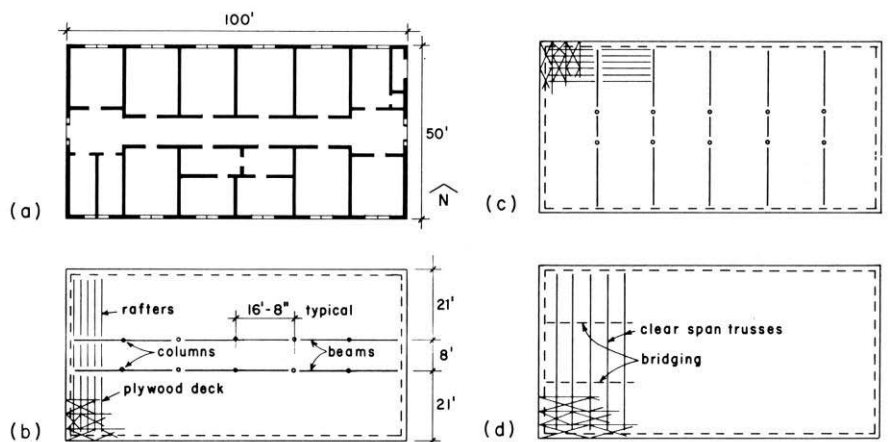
Developed plan for interior partitioning and alternatives for the roof framing.
